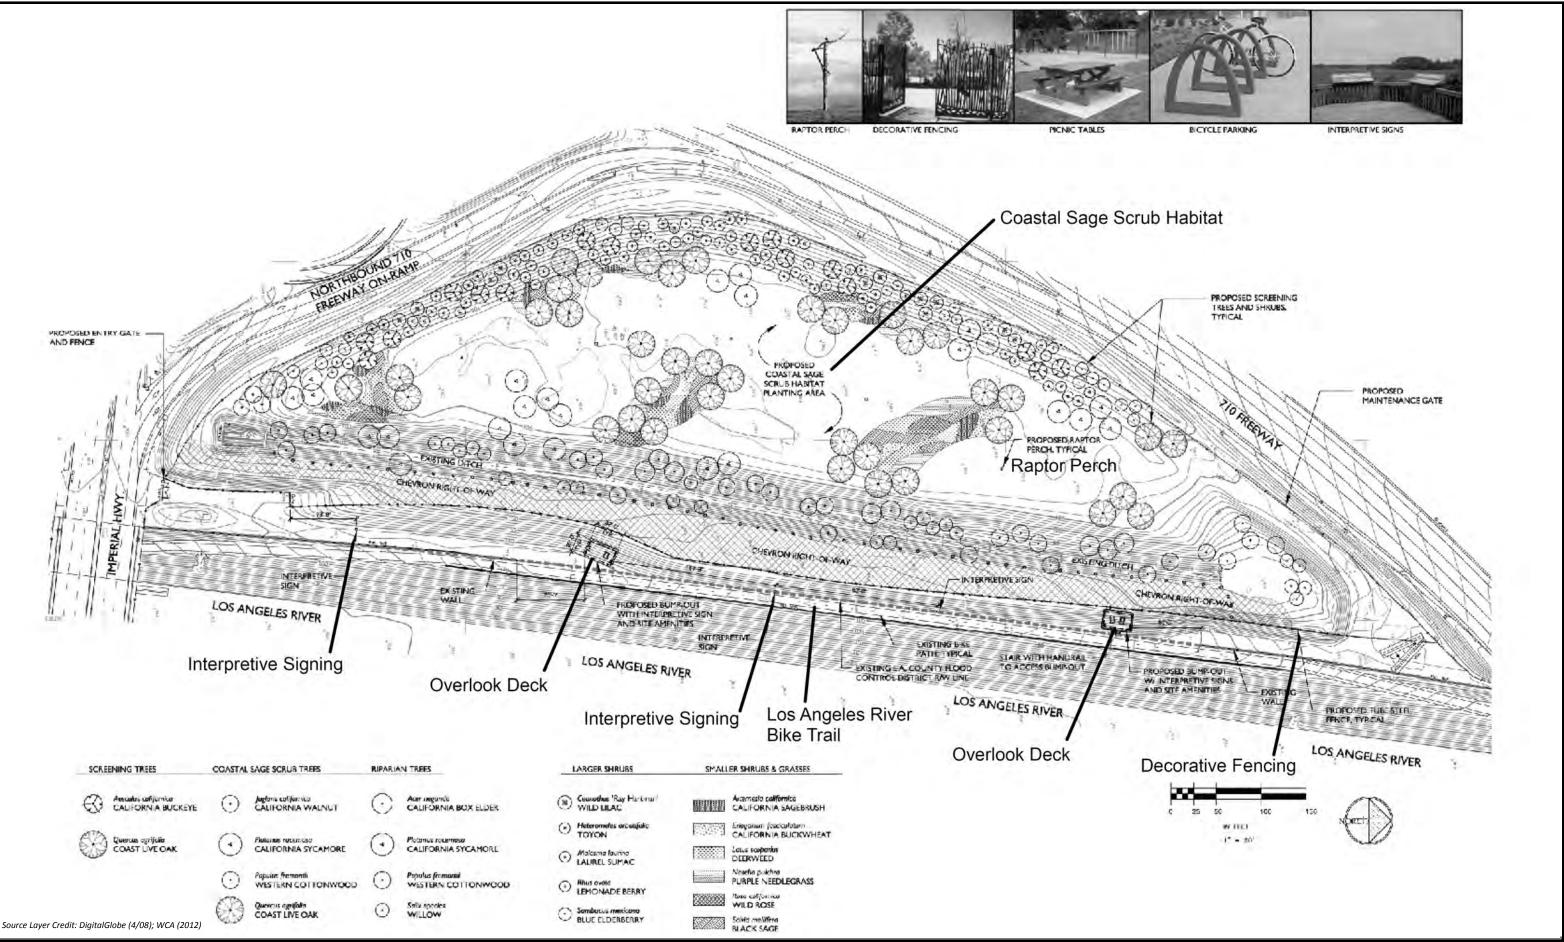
SITE PLAN FOR PARQUE DOS RIOS I-710 Corridor Project
